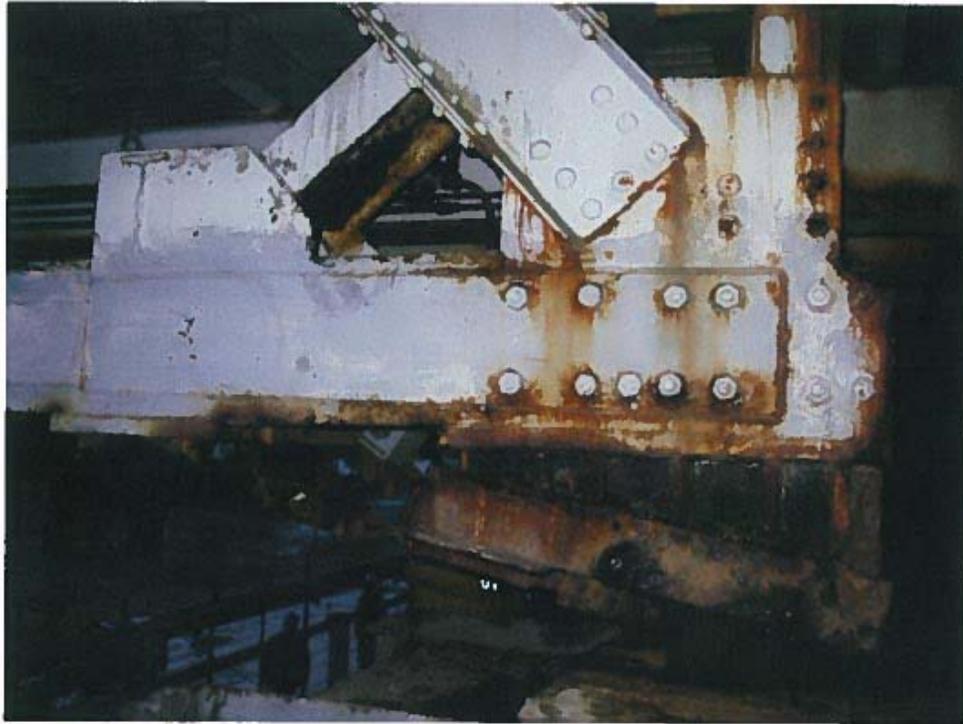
Perforation / section loss at gusset plate panel point 2W south truss bottom chord.
